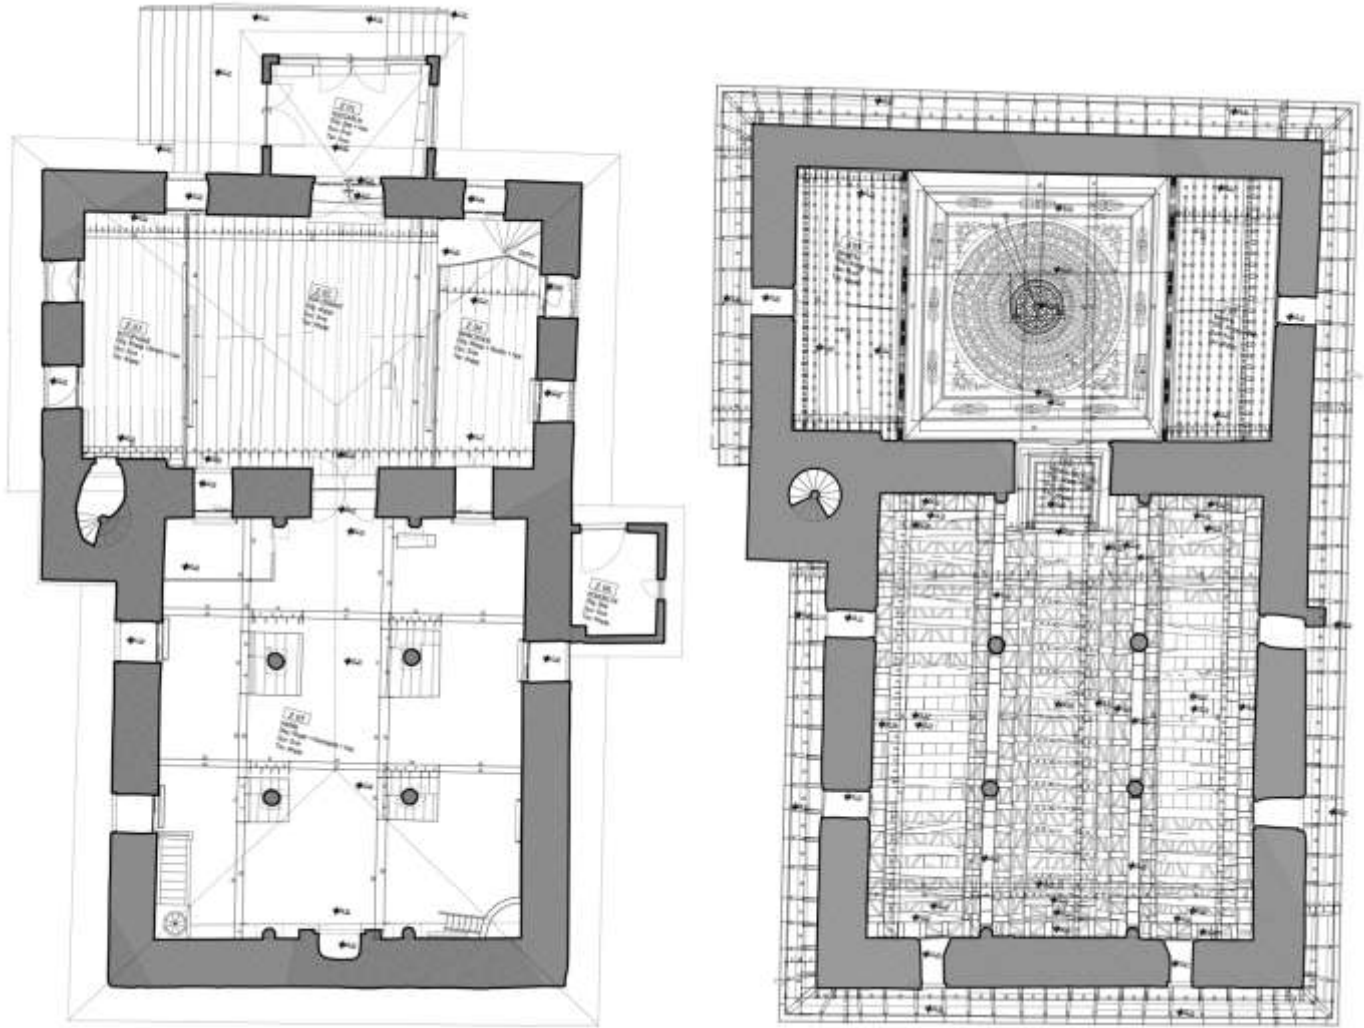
Harim plan and ceiling plan (drawn by ANB Architectural Office)
